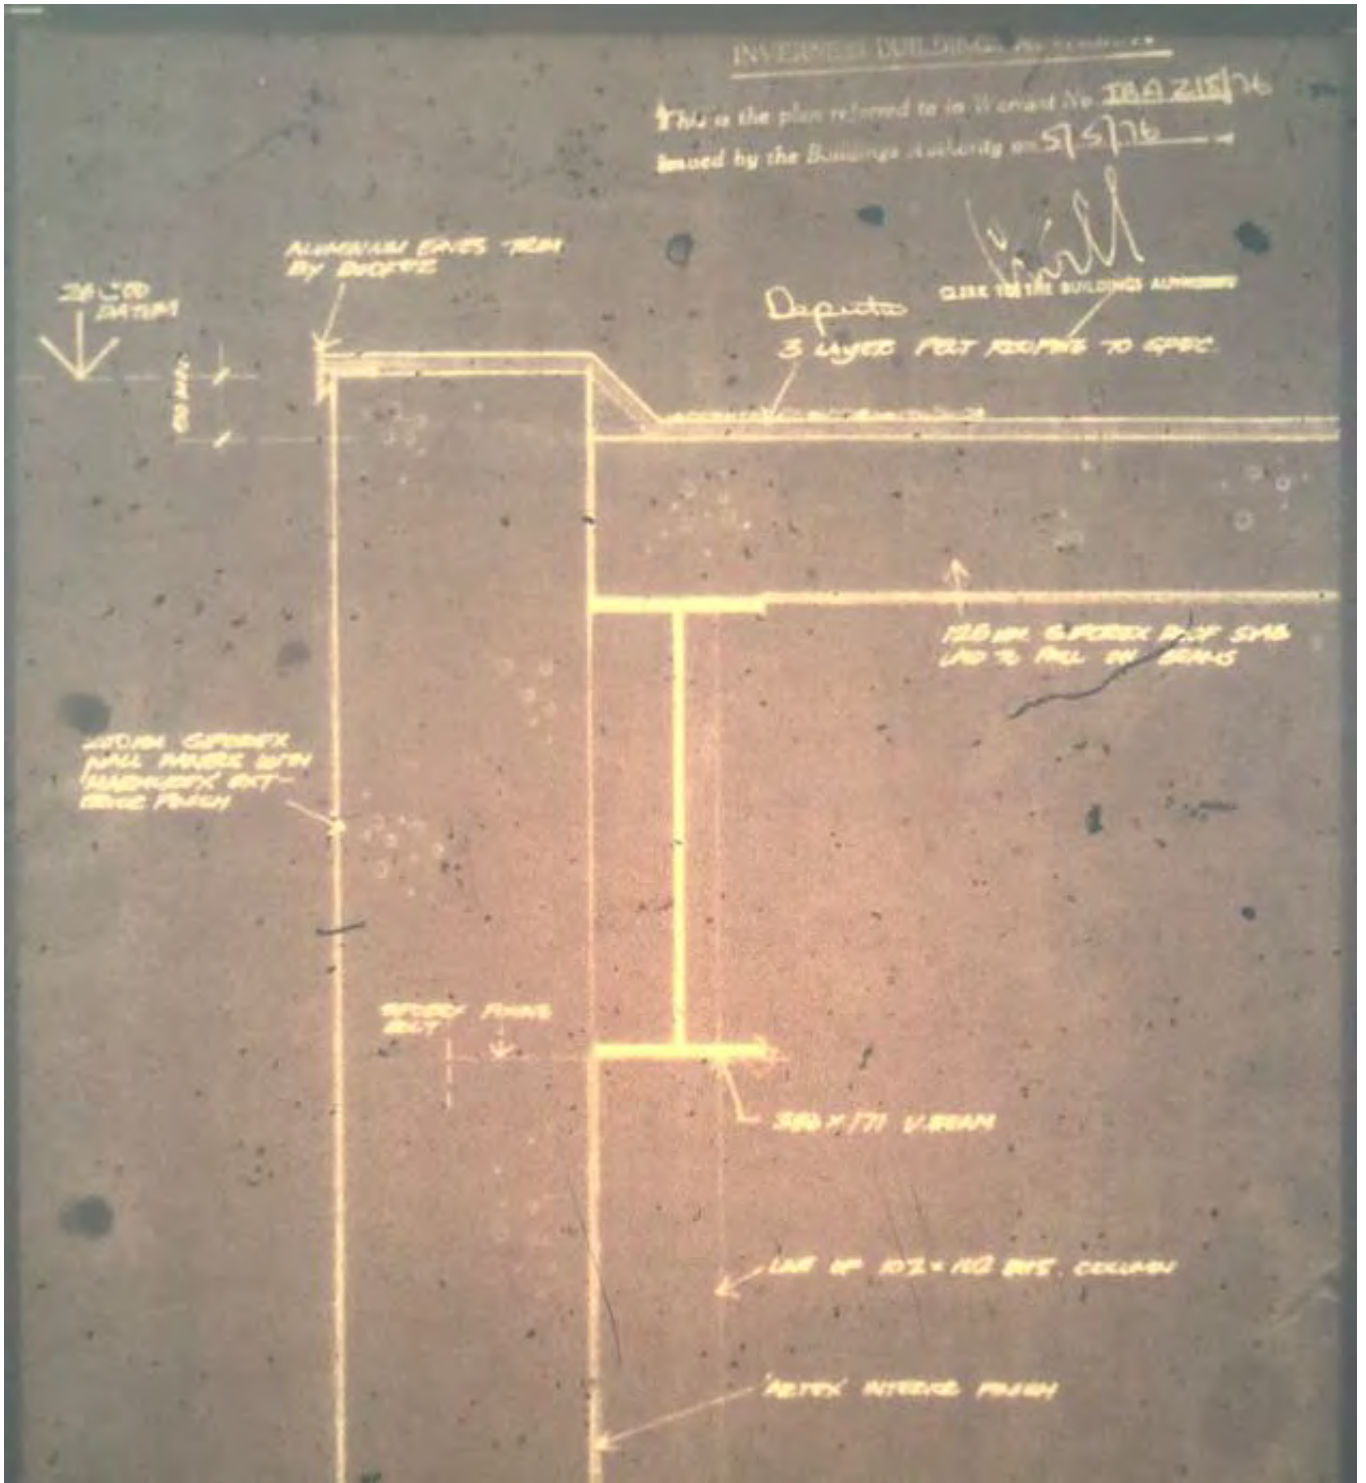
Indicating 126mm siporex roof slab, 200mm siporex wall panels
